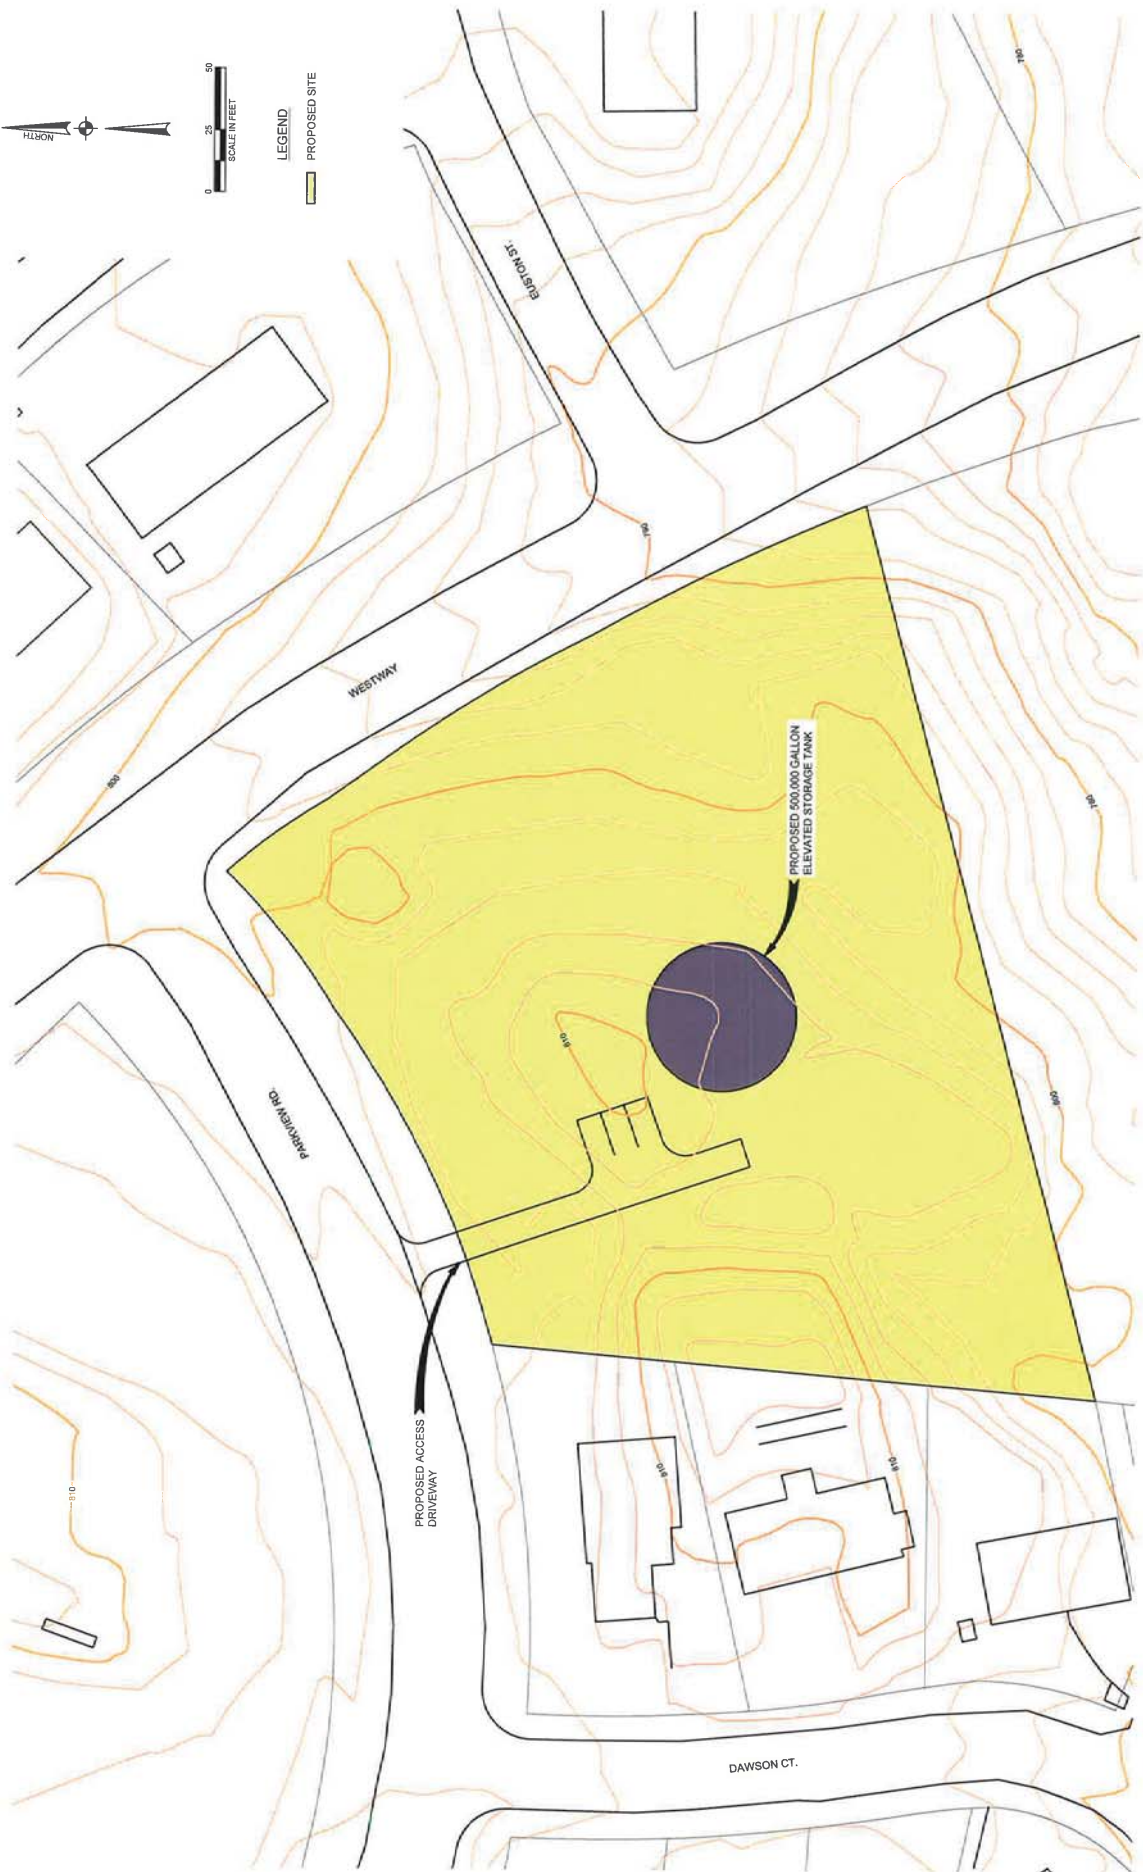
Preliminary Arrangement for a 500,000 Gallon Elevated Storage Tank at the Proposed New Site
